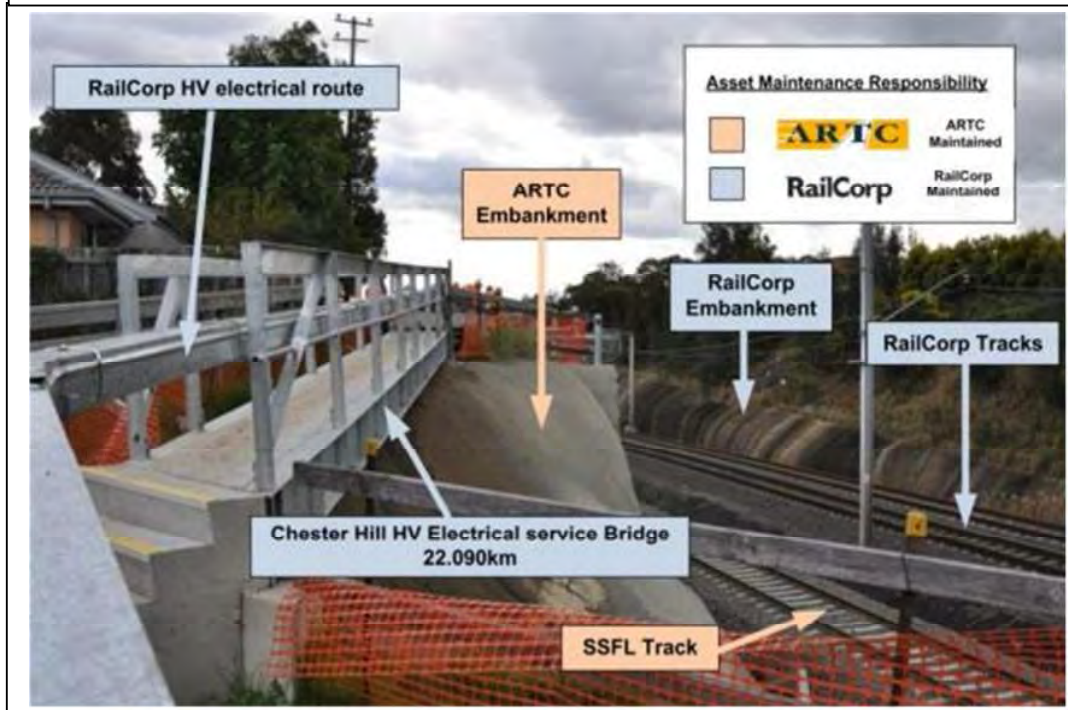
View of RailCorp Service Overbridge looking towards Sefton Dive, (Country end).
